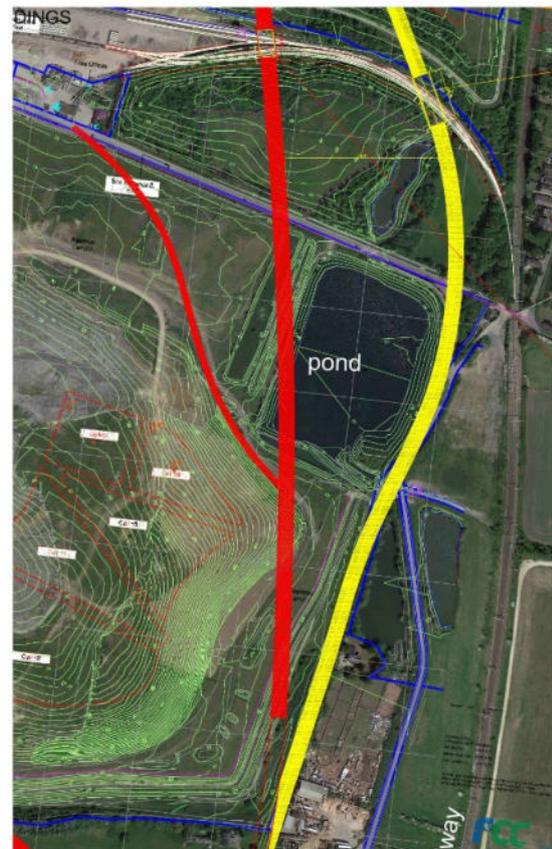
Second alternative alignment of the road approaching a repositioned bridge over Appleford Sidings.
